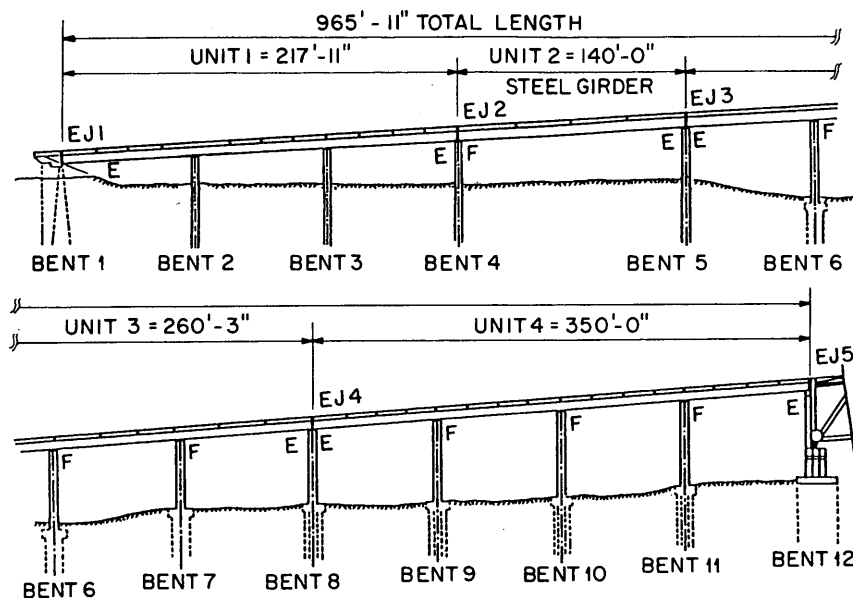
North elevation of the east approach of the U.S. 190 bridge at Krotz Springs, Louisiana.
